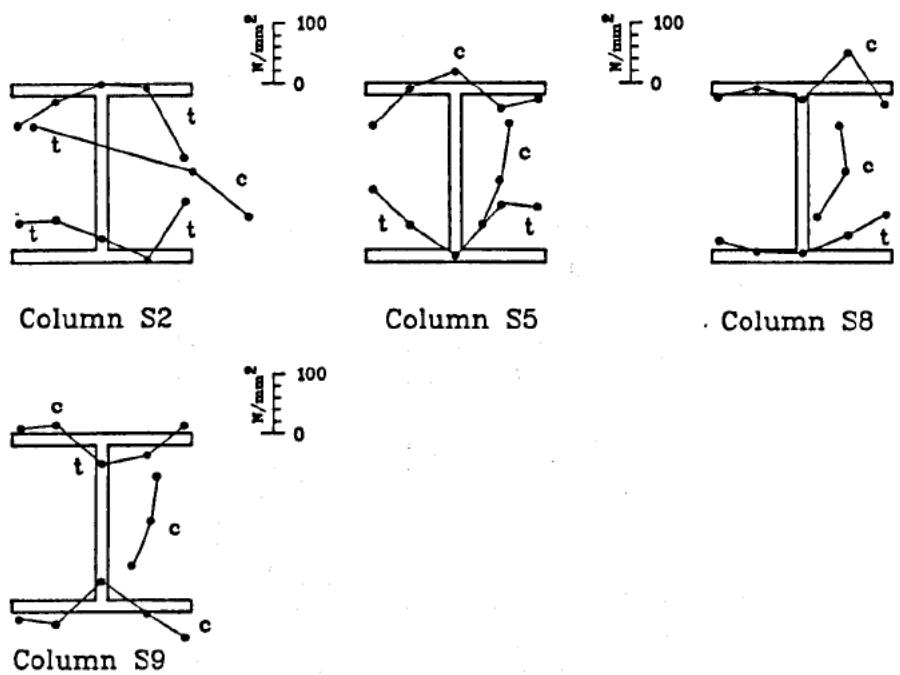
Residual stress patterns from column sections used in the subassemblage tests.
